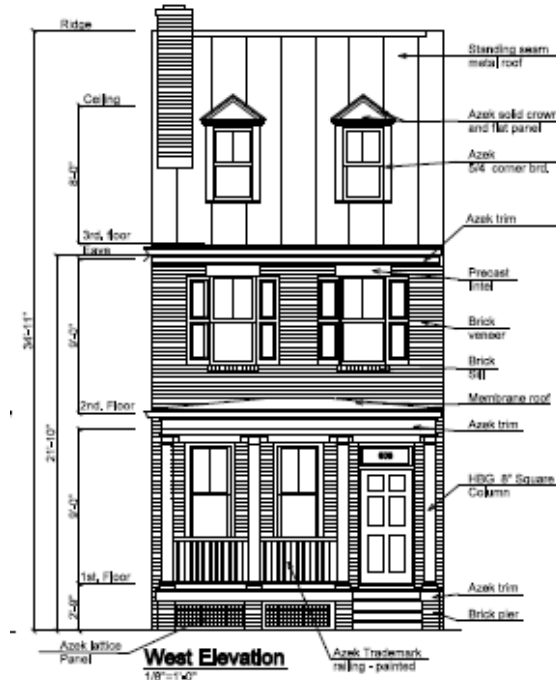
Approved but as yet Unconstructed New Townhouse at 606 S Fairfax
